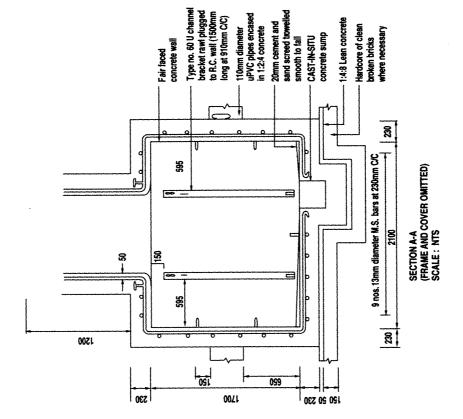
MANHOLE DRAWINGS - TYPE MX3
